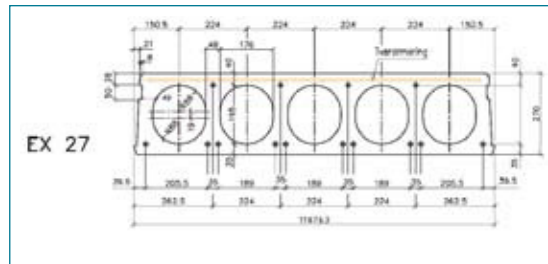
Cross section of hollow core slab – no top reinforcement or cross reinforcement of mild steel was supplied.
